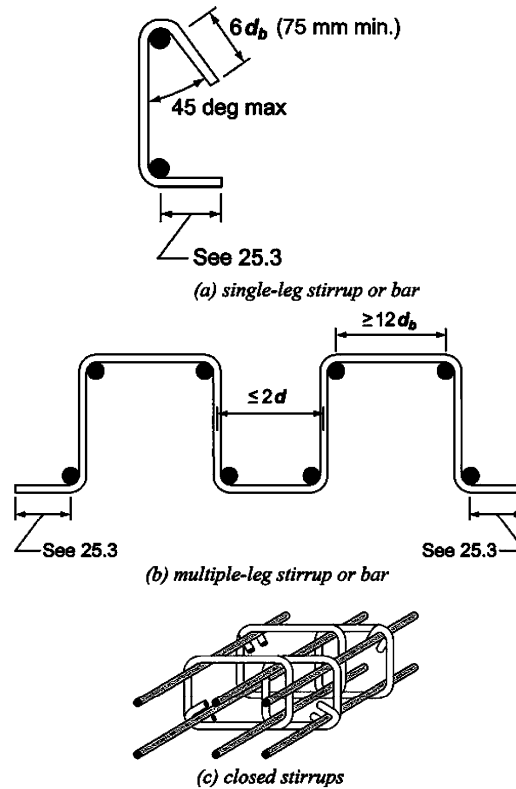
(a)-(c)—Single- or multiple-leg stirrup-type slab shear reinforcement.
